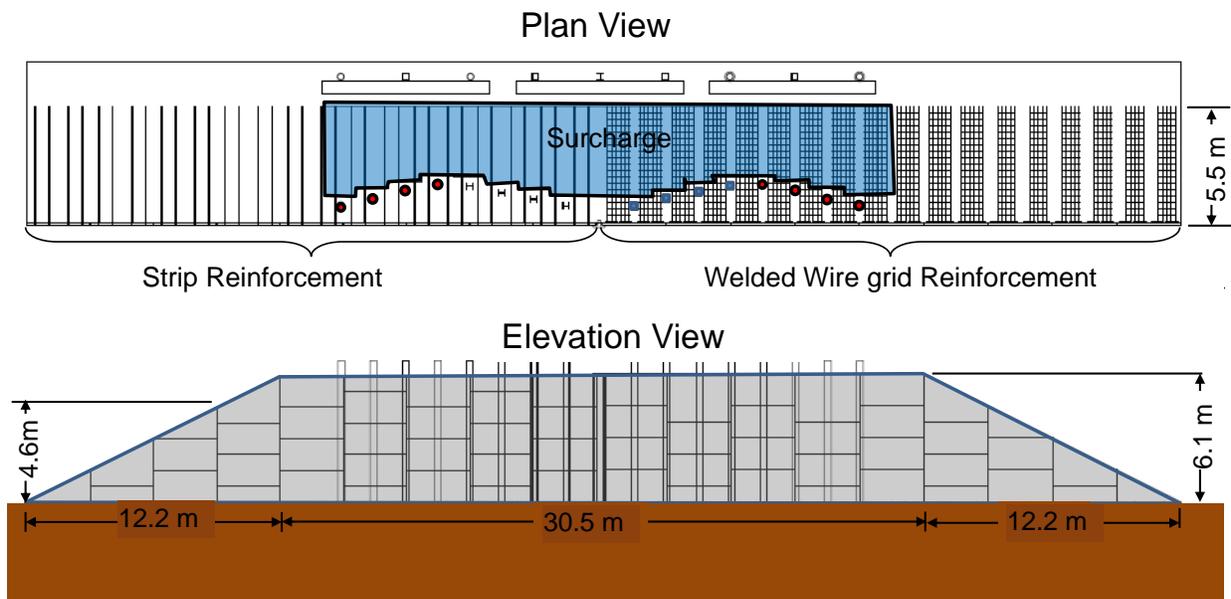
Plan and profile views of mechanically stabilized earth (MSE) wall, test piles, and reinforcement for Phase 1 (4.6-m or 15-ft) and Phase 2 (6.1-m or 20-ft) high wall.
